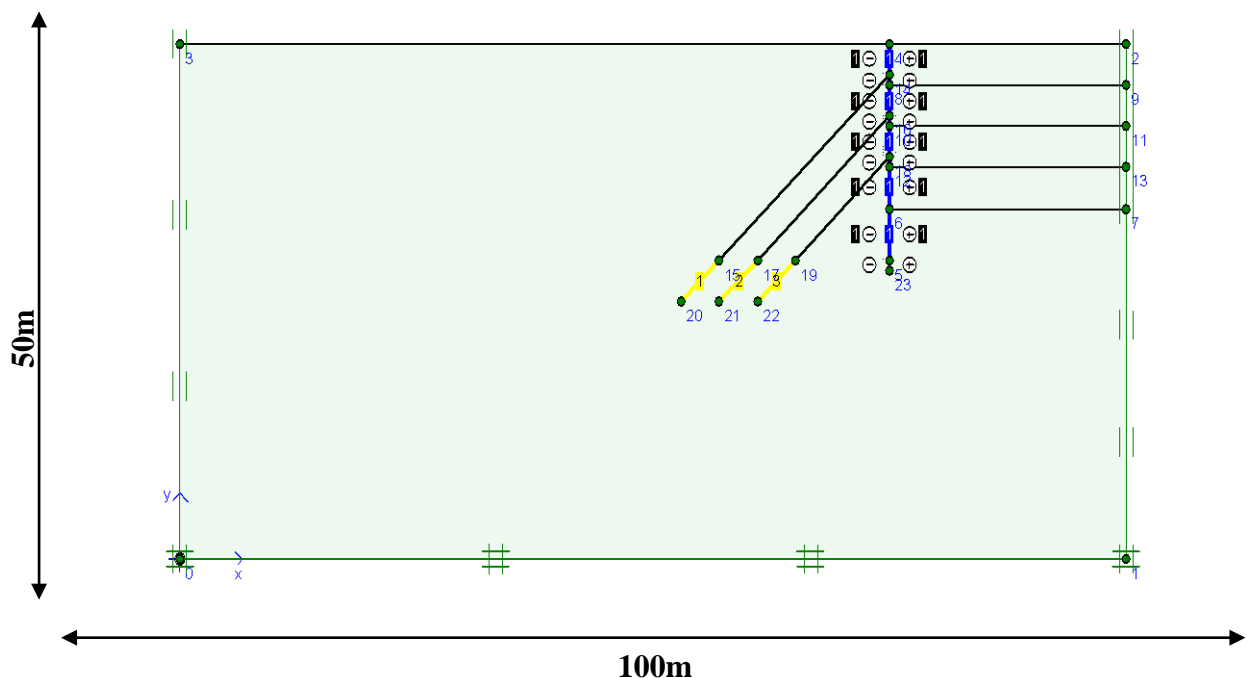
1 Typical finite element model in PLAXIS for a deep excavation.
